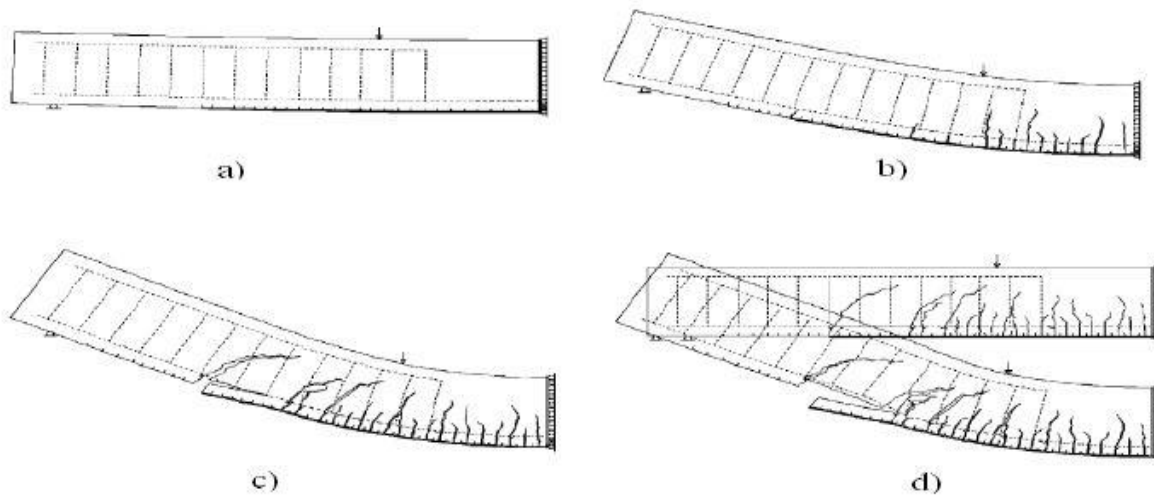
Crack propagation in externally bonded FRP concrete beam: (a) uniformly-spaced cracks at the initial loading; (b) migration of major crack and initiation of new cracks; (c) initiation of horizontal crack; (d) plate-end debonding (Yang, et al., 2003)
